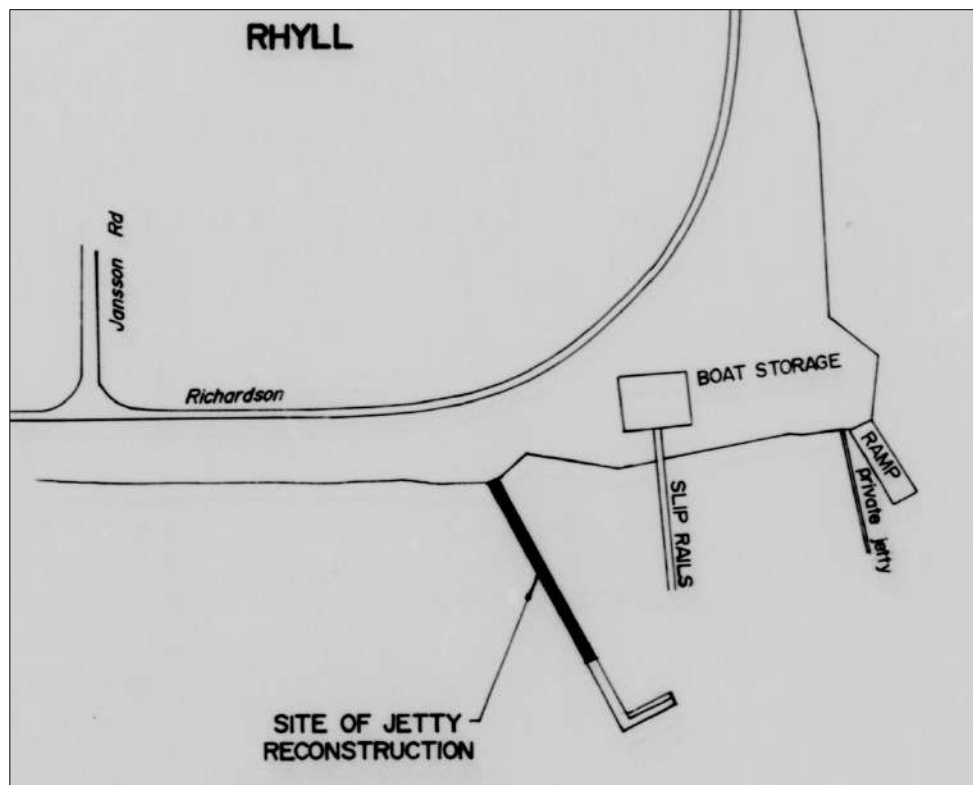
Site plan, extracted from a 1985 Public Works Department drawing for the reconstruction of Rhyll jetty.
